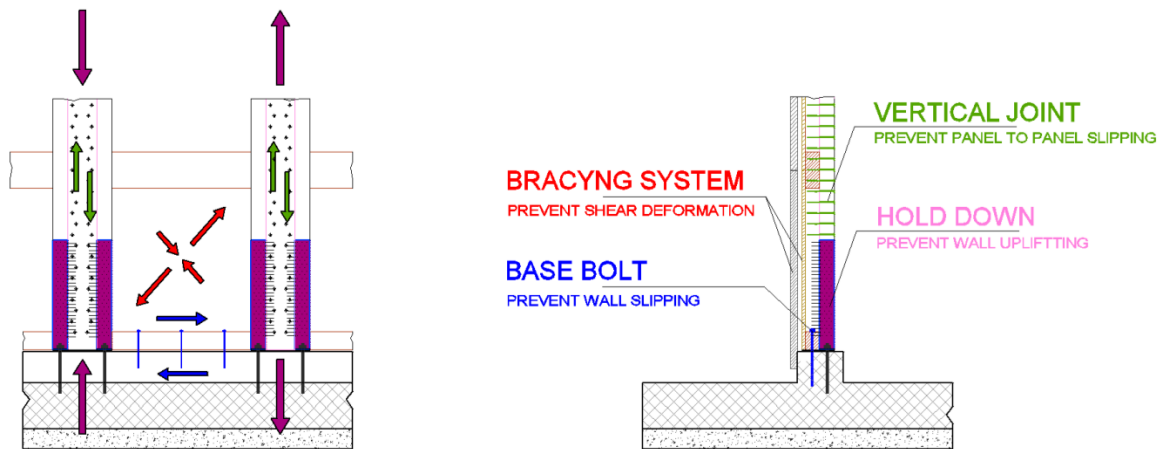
Connection systems used in the developed mixed wood-concrete shearwalls.
